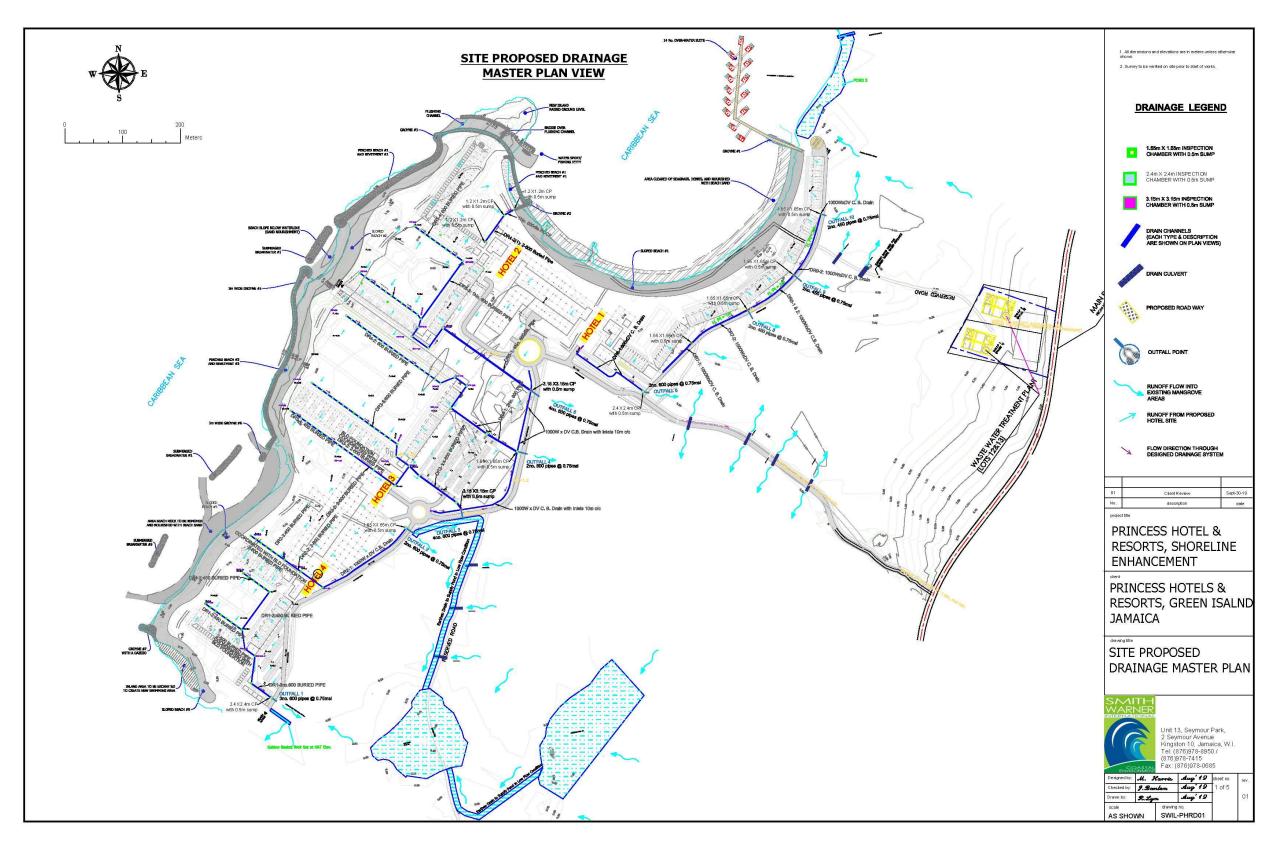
and Figure 5-7 show the drainage master plan layout while Figure 5-8 to Figure 5-11 shows enlarged drainage plans for each hotel section (Hotel 1, 2, 3 and 4). The concept allows the proposed site to drain freely into the mangrove forest and maintain its natural drainage pattern. This will be done by a series of buried pipes (0.45 - 0.6m diameters), covered box drains (1m wide x 0.45 m deep) and culverts to maintain hydrologic flows between areas separated by roads or dykes (Smith Warner International Limited, 2019). The retention pond areas will be reforested with mangroves as per the request of NEPA to rehabilitate two mangrove areas.
